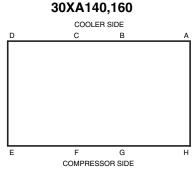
B — Unit Mounting Weights (Units with Al/Cu Condenser Coils) (cont)
